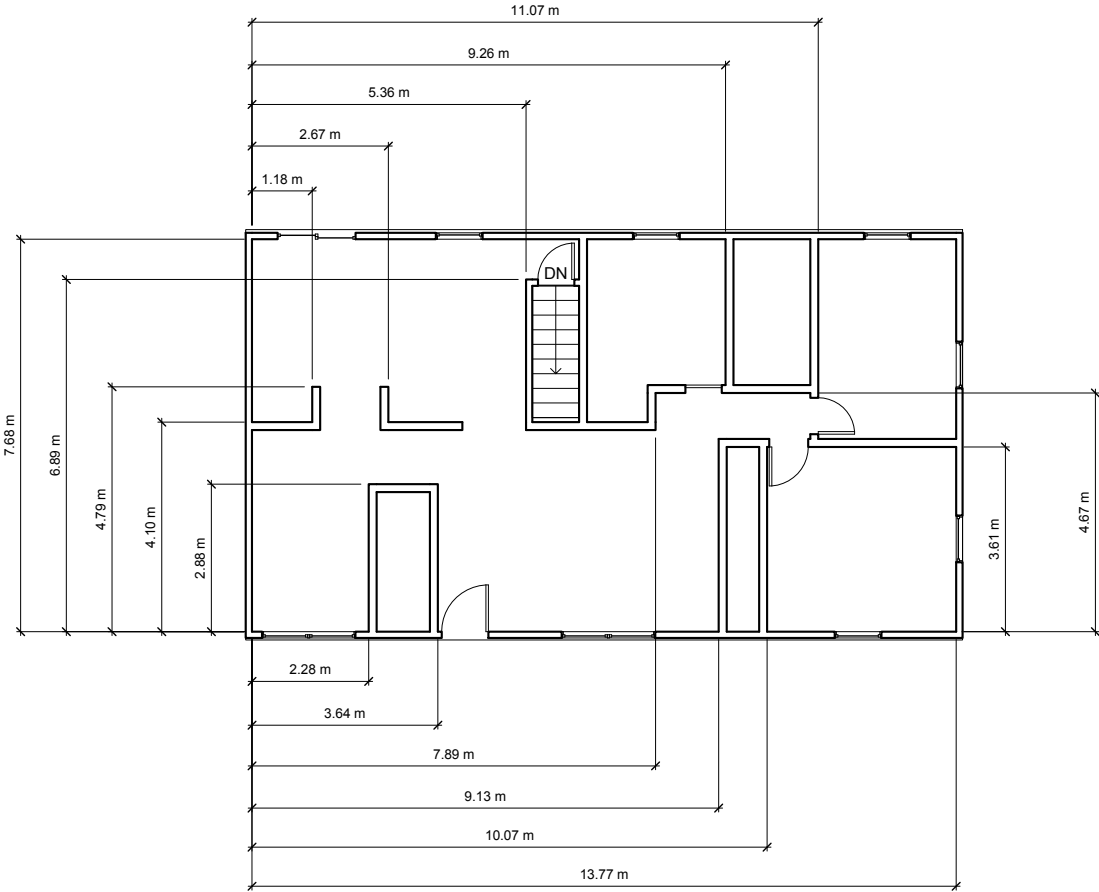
Fully Dimensioned Floor Plan of the First Floor
